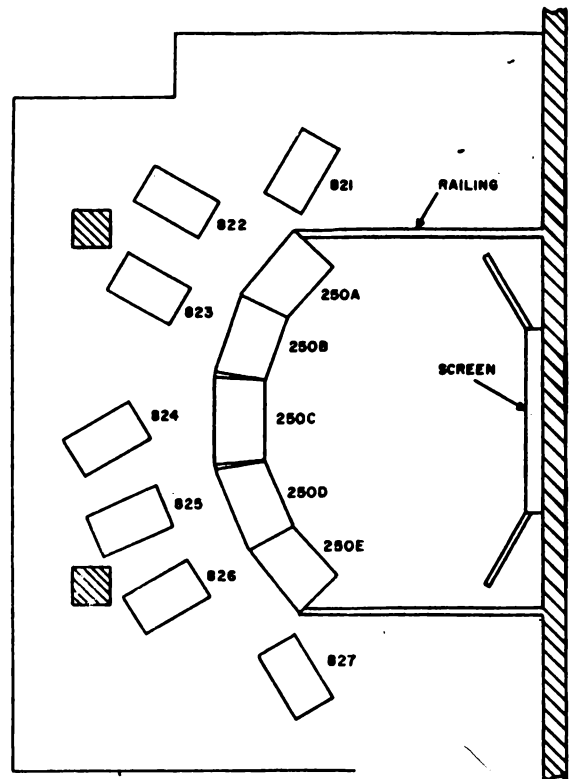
Sector Command Balcony Area, Partial Floor Plan
